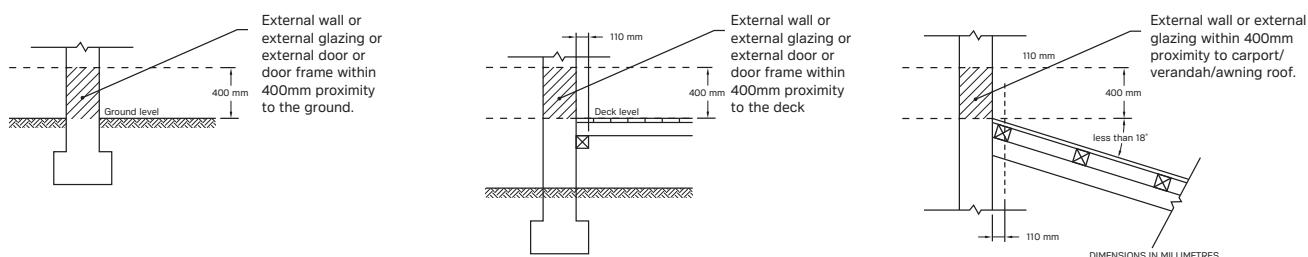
EXTERNAL WALLS OR EXTERNAL GLAZING, OR EXTERNAL DOORFRAMES WITHIN LIMITS ABOVE GROUND, DECKS, CARPORT ROOFS (Source: AS 3959:2018)
